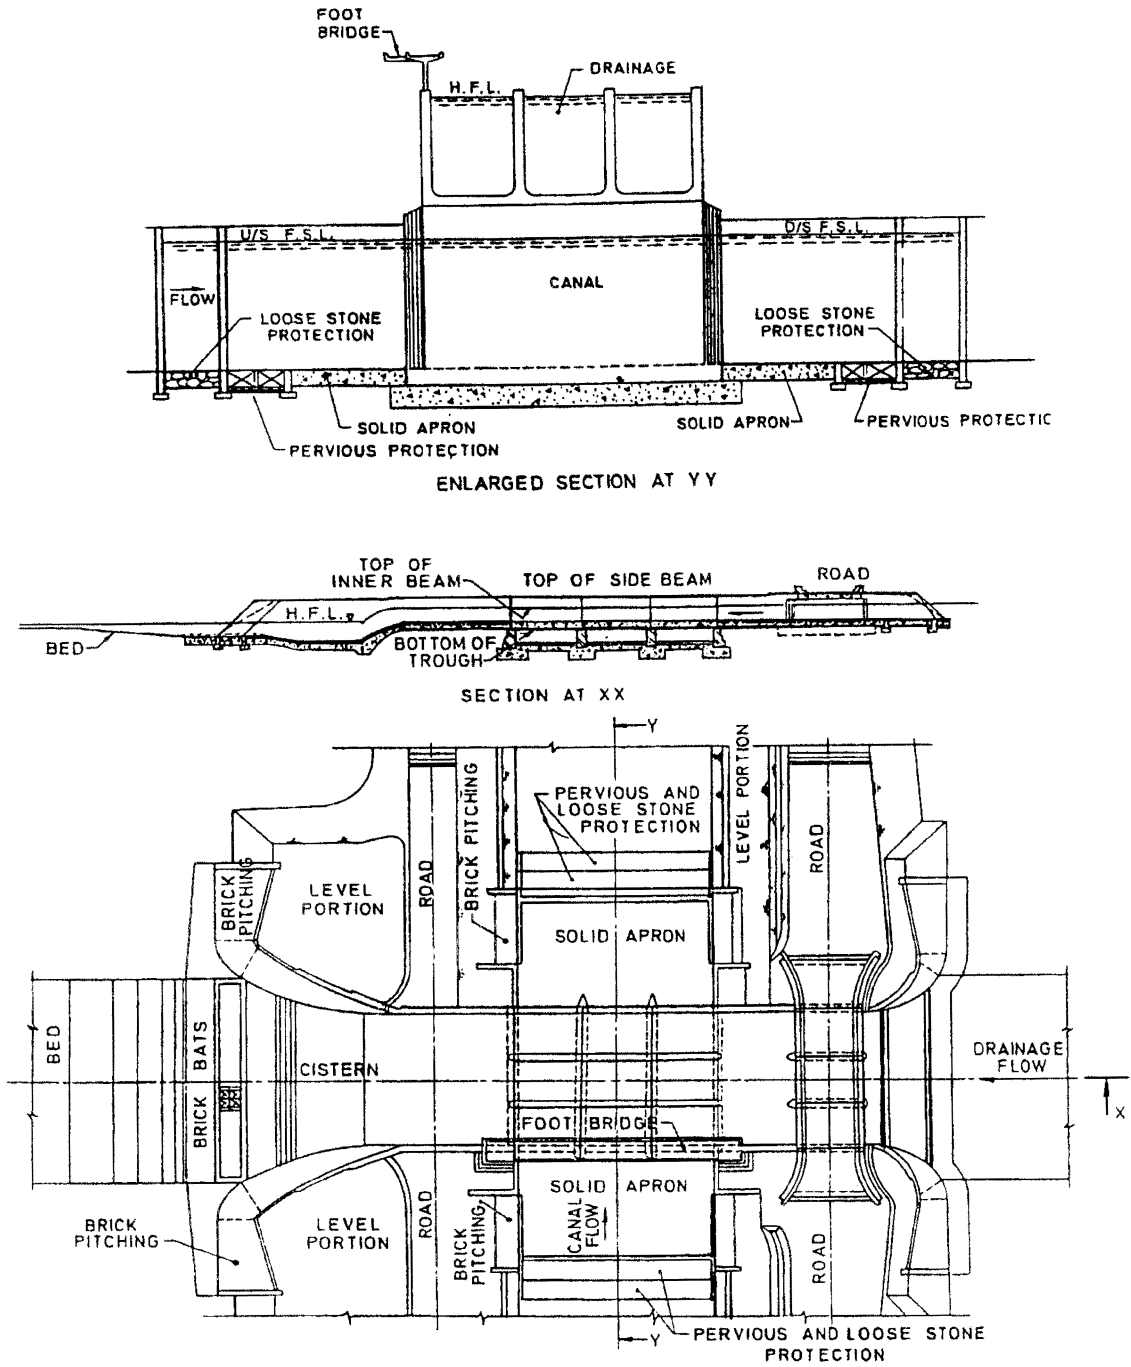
A TYPICAL LAYOUT OF A SUPERPASSAGE
